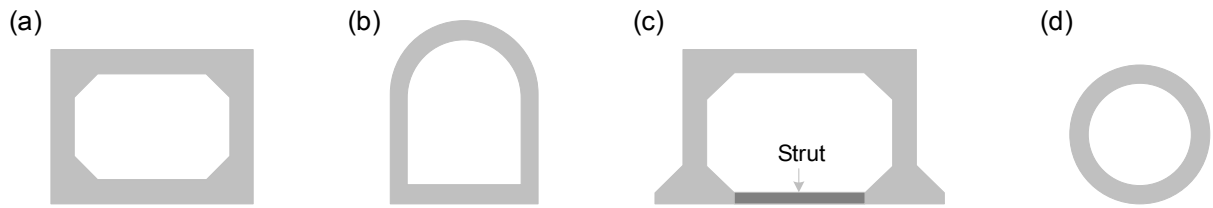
Representative structures of conventional types of culverts: (a) box culvert, (b) arch culvert, (c) portal type of culvert, and (d) pipe culvert (Japan Road Association, 2010).
